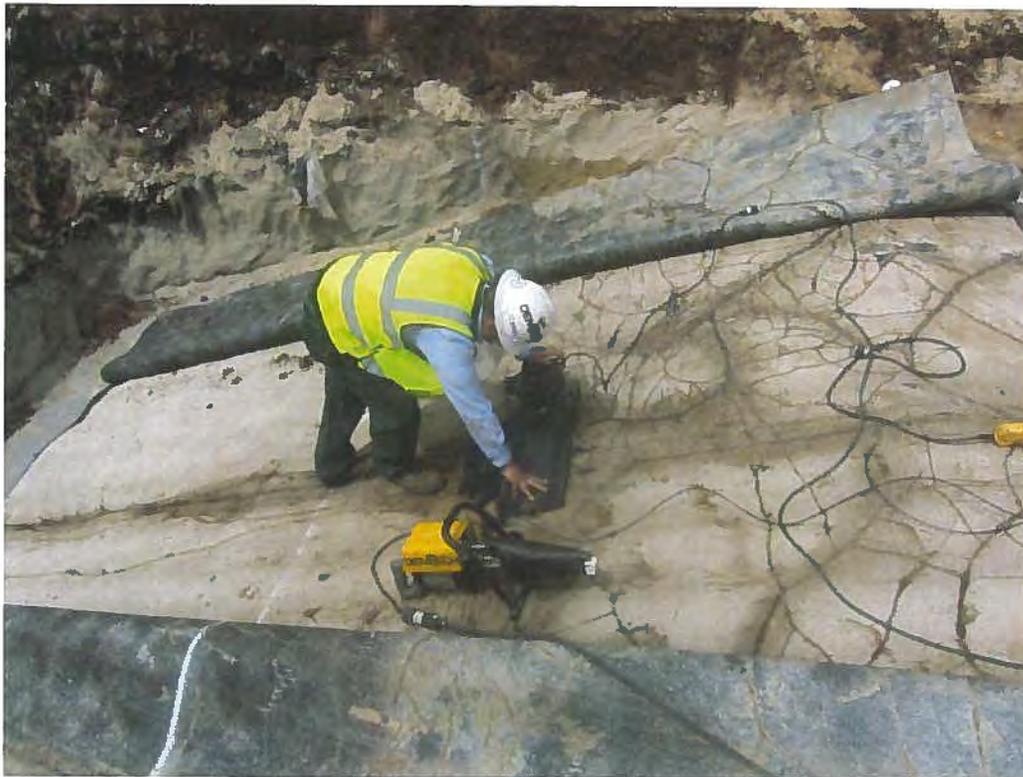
Non-destructive vacuum box testing to verify integrity of the patch extrusion weld
